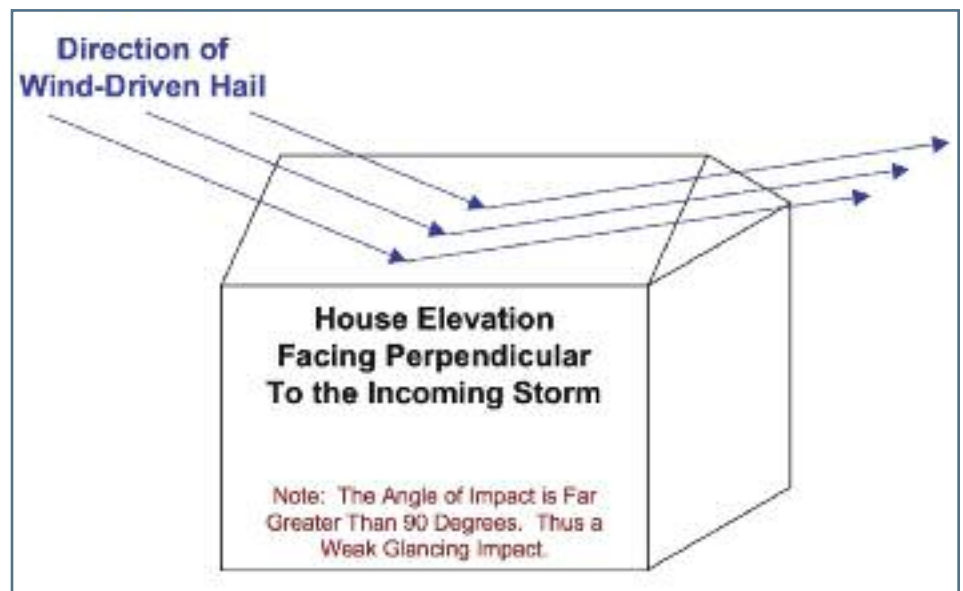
Hail impact on roof elevations facing perpendicular to an incoming storm.
